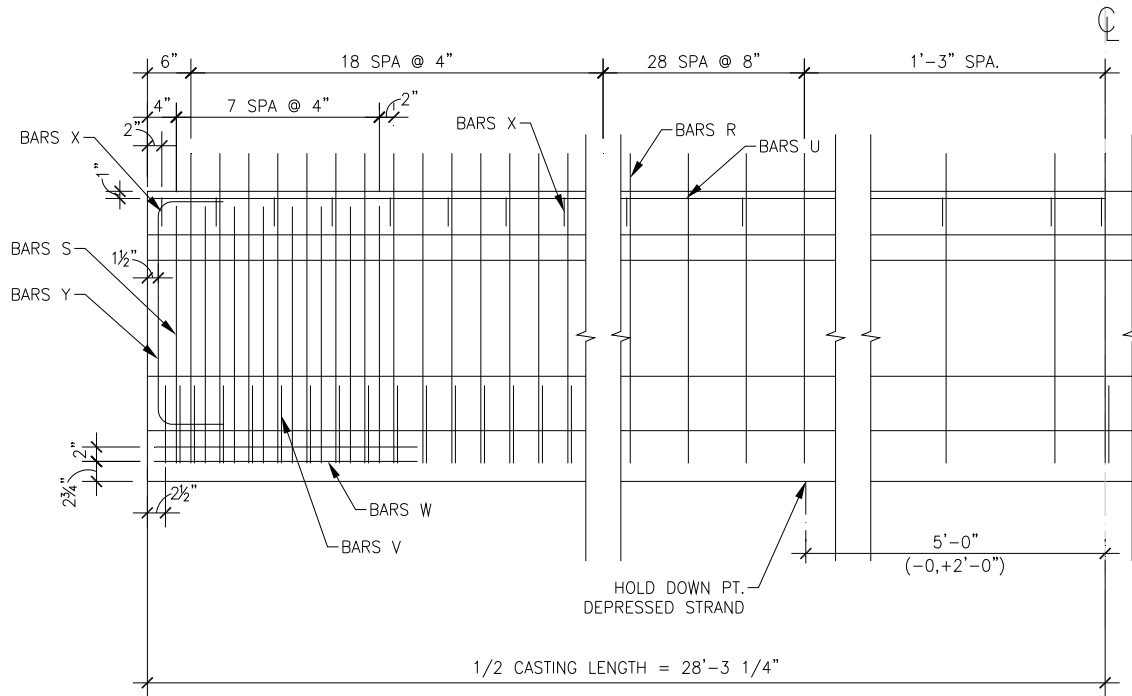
Shear Reinforcement Design: TxDOT C-Beam Specimens
